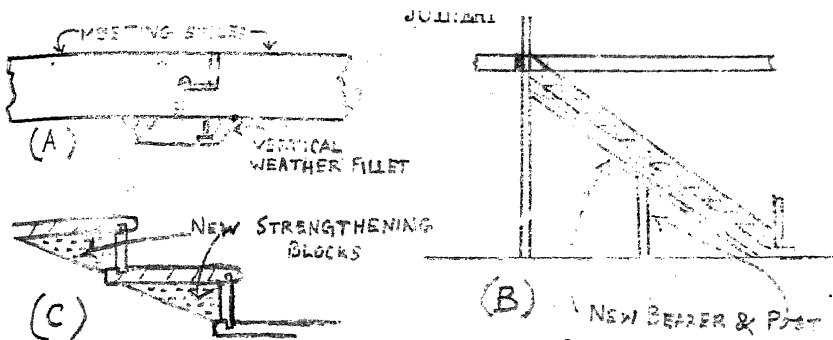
(a) Adding weather fillet to meeting stiles of French window. (b) Strengthening stairs. (c) Blocking treads and risers.
